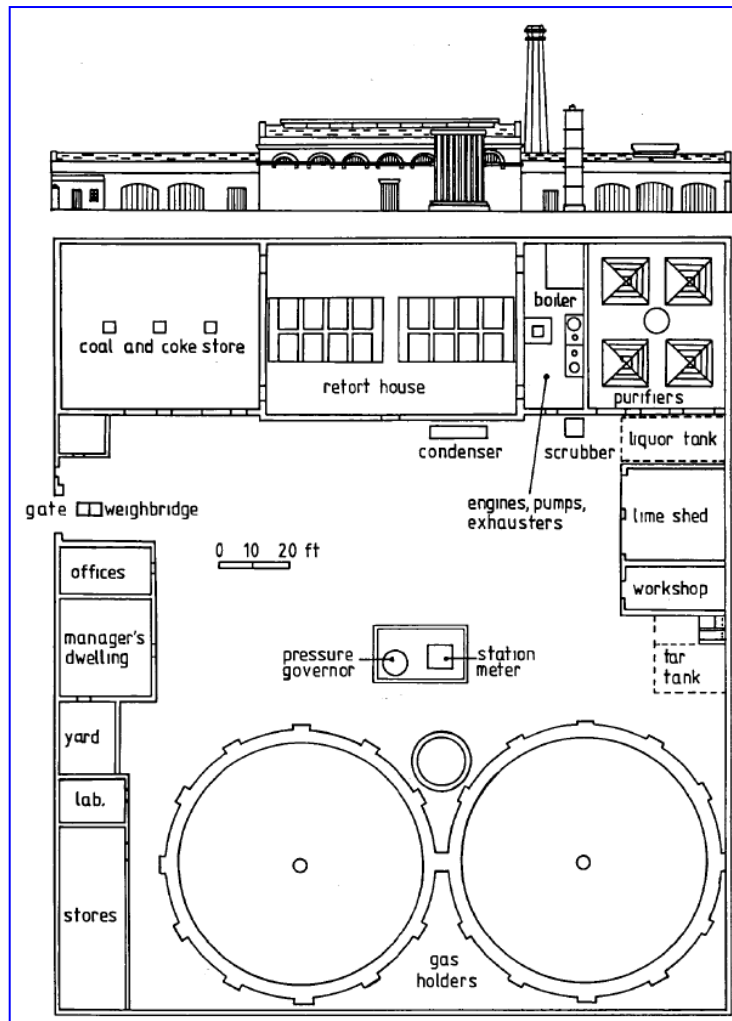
Typical medium-sized gasworks layout from the 1870s (after Newbigging 1879)
